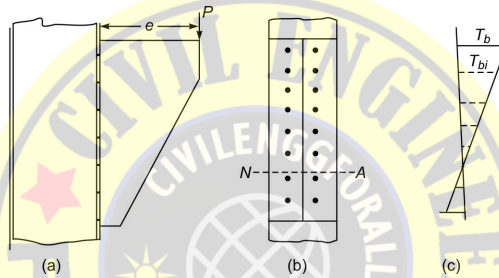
Load causing moment in the plane perpendicular to the plane of bolt
